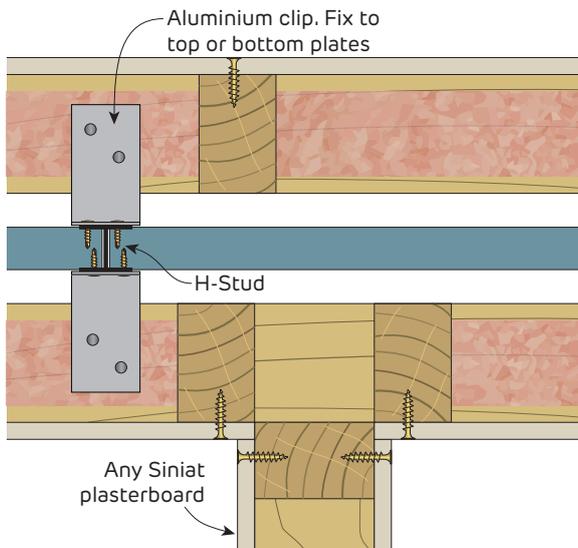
Interhome Wall with Non-Fire Rated Intersecting Wall
